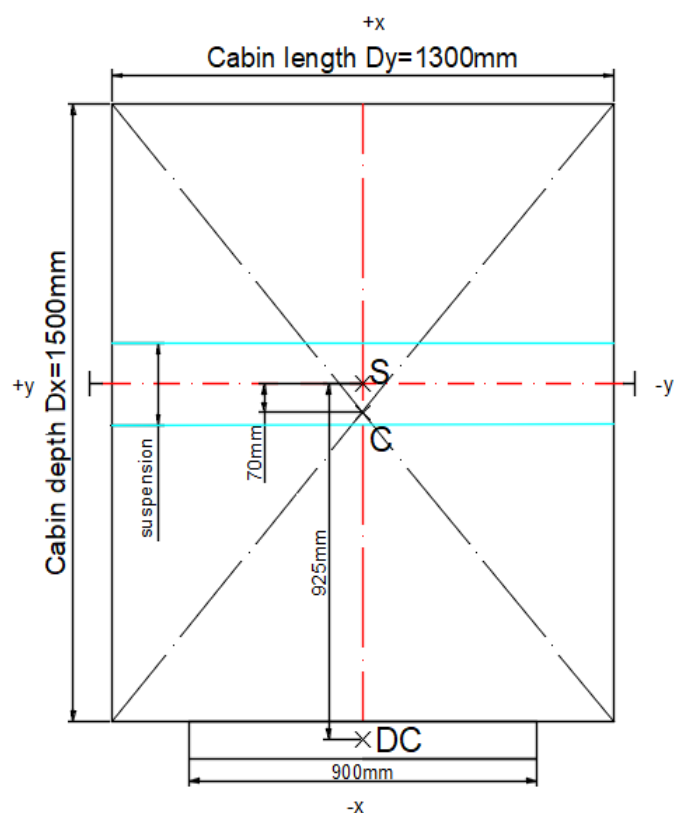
Dimensions of the eccentrically guided elevator car investigated.
